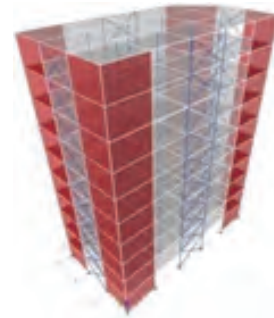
Building with shear wall, bracings and CFST columns (outer frame bottom 1-6 stories)
